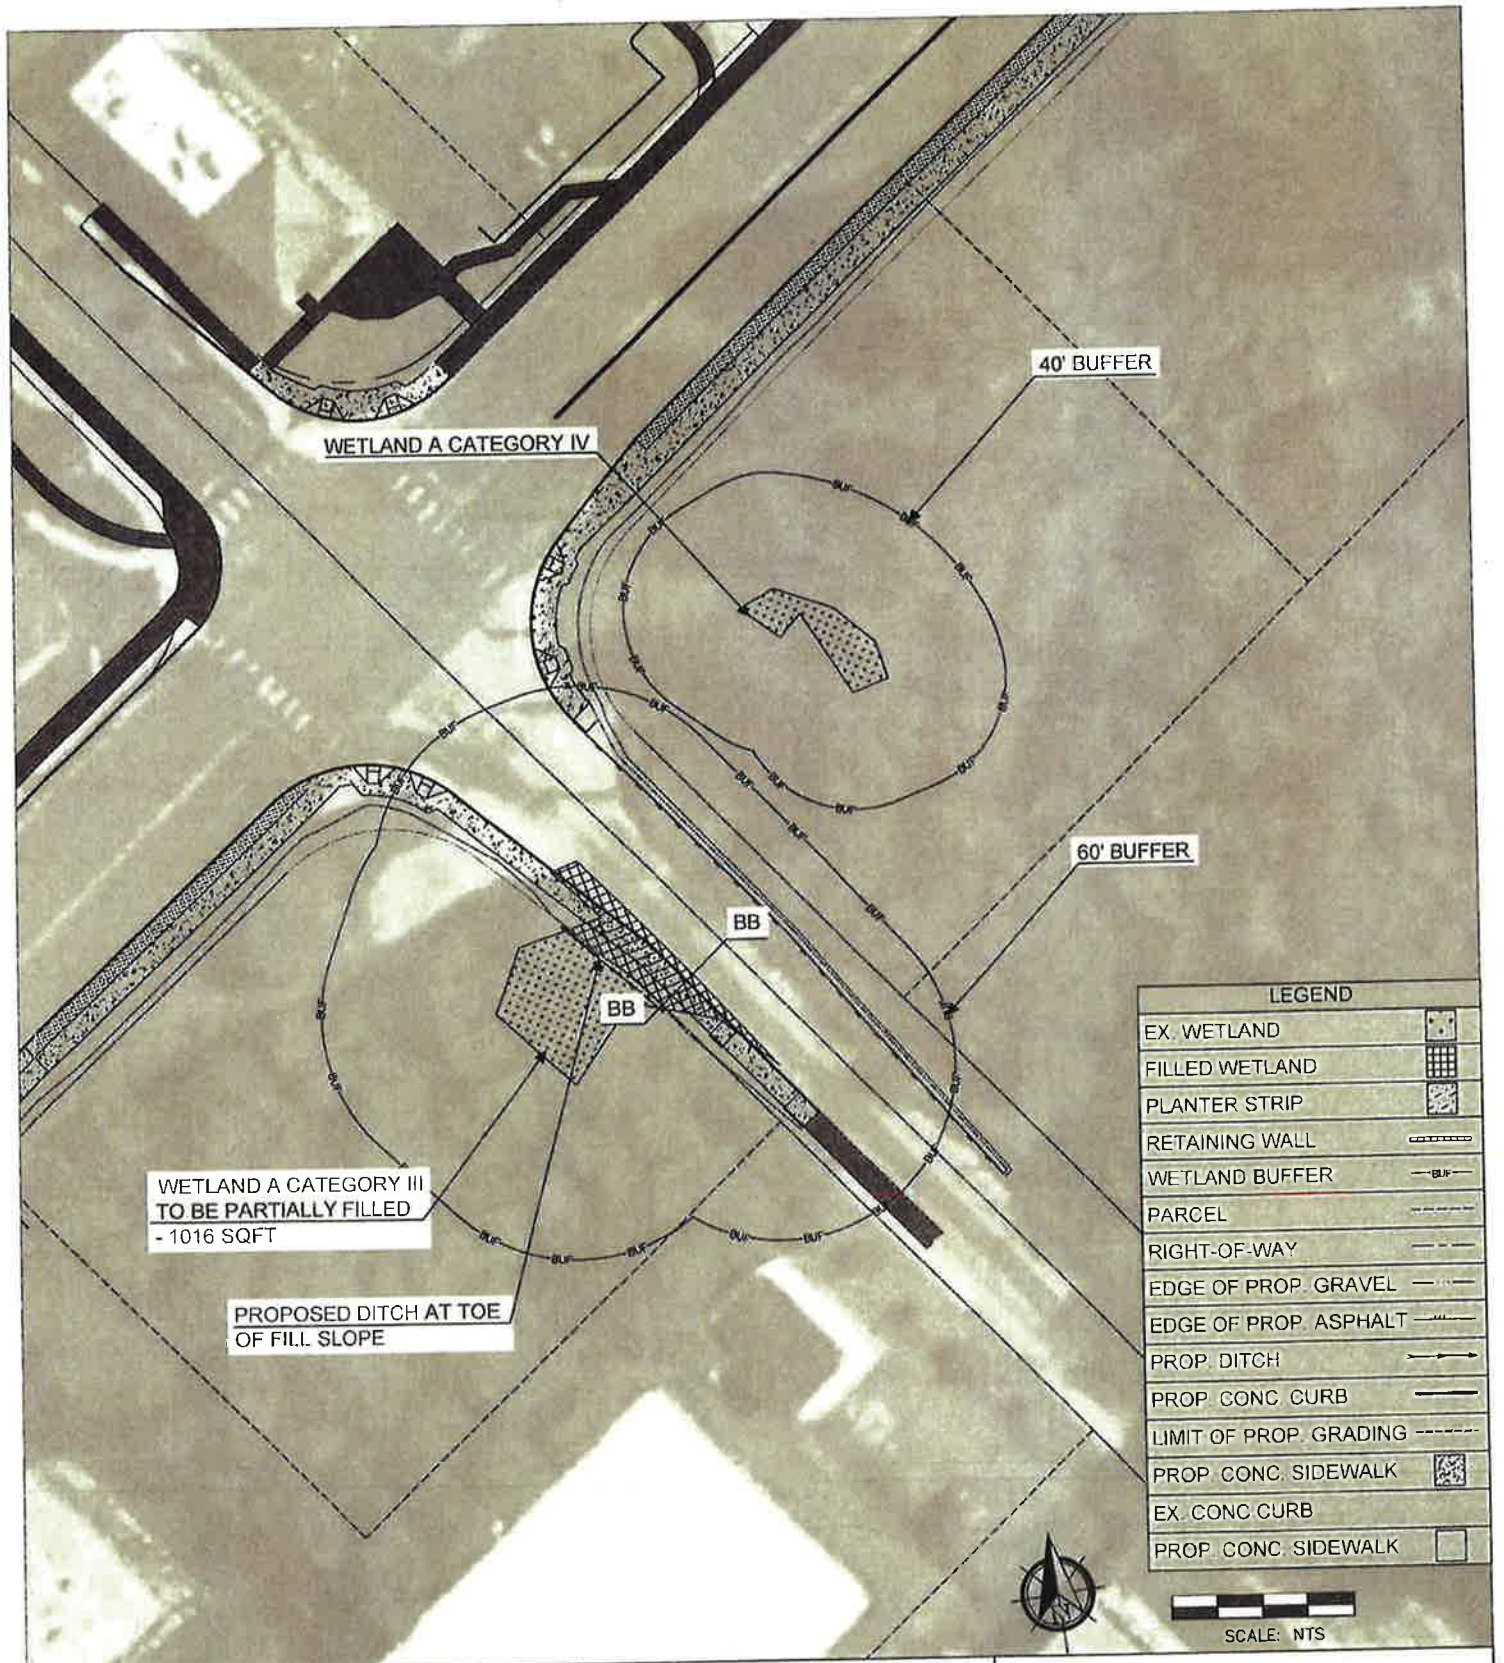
OFF SITE EXISTING CONDITIONS
